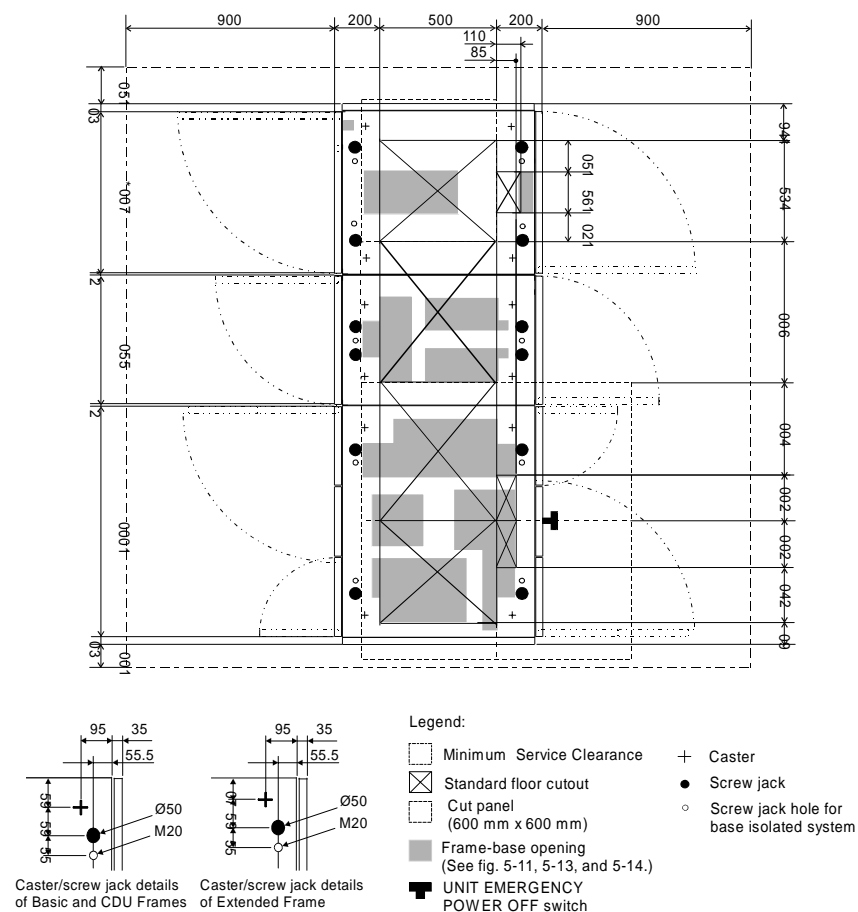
Processor Unit Floor Plan, F-7E Turbo—Basic and CDU Frames
